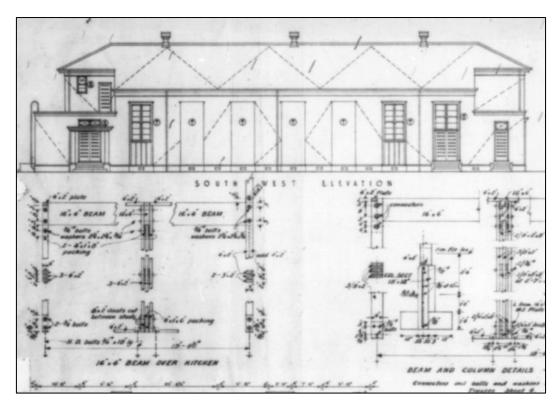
Extract from fig. 103 above. 'South-West Elevation' and various structural details for 'RNZAF Station Hobsonville Institute Building'. This elevation would be the east elevation at Hobsonville, reversed about the y-axis.
